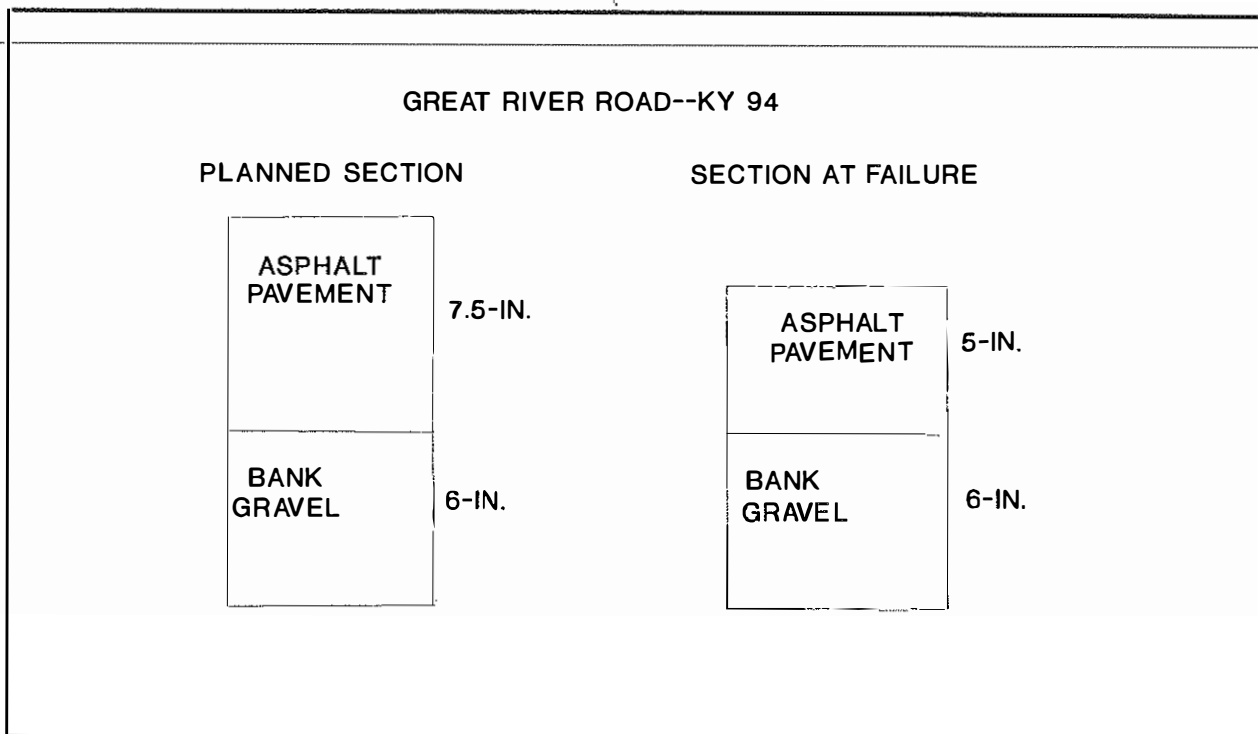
Design Pavement Section of the Great River Road (KY 94) and the Pavement Section at the Time of Failure.
